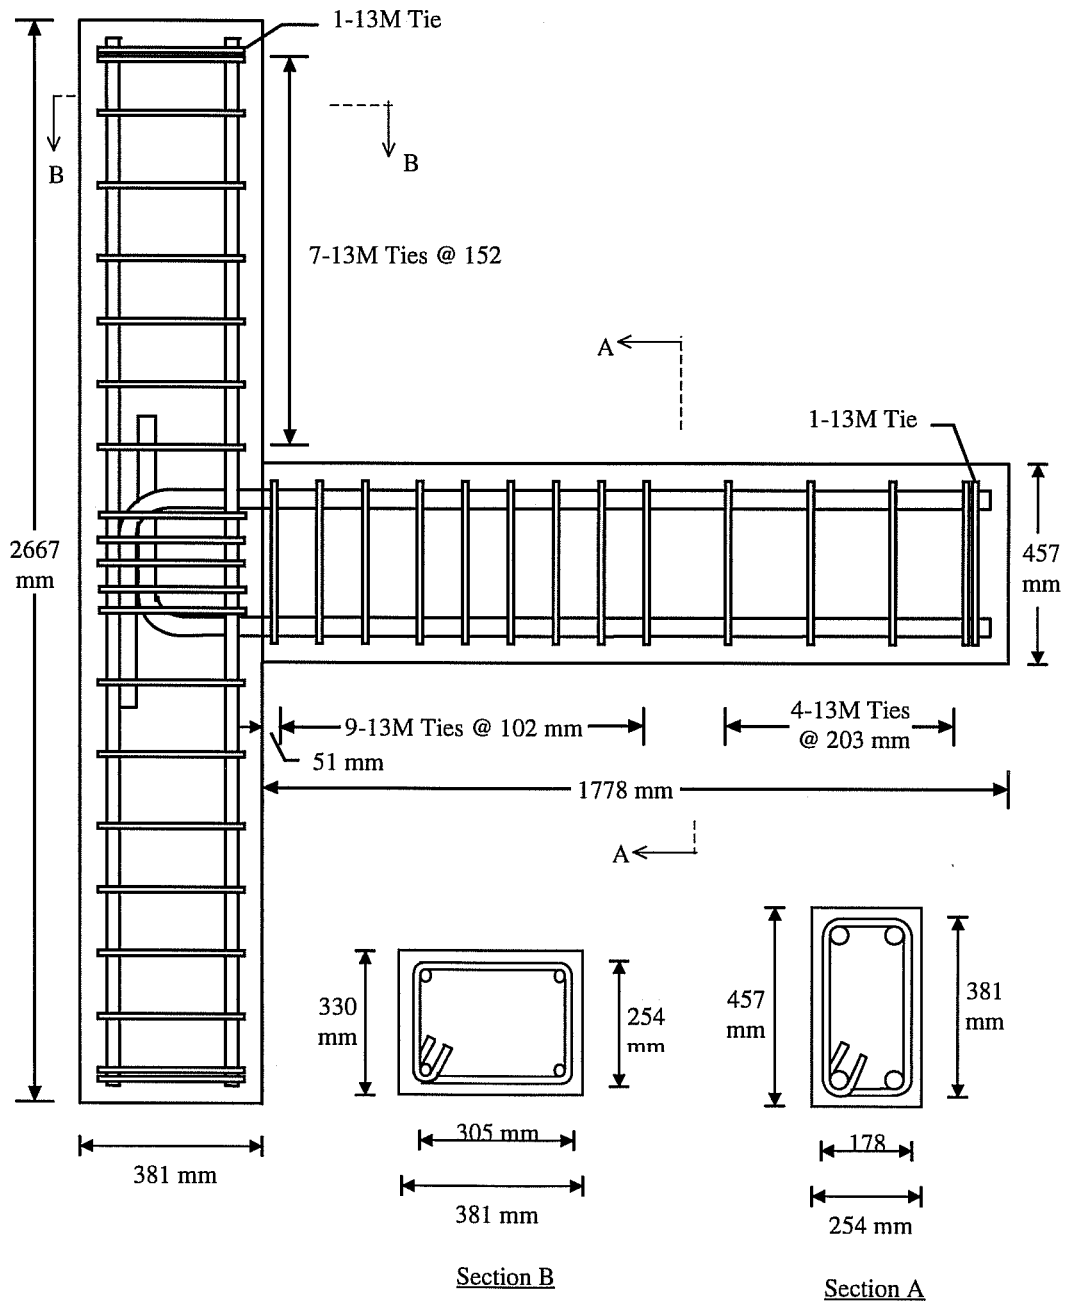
Concrete Dimensions and Reinforcement Details of Unit 4 [26]
